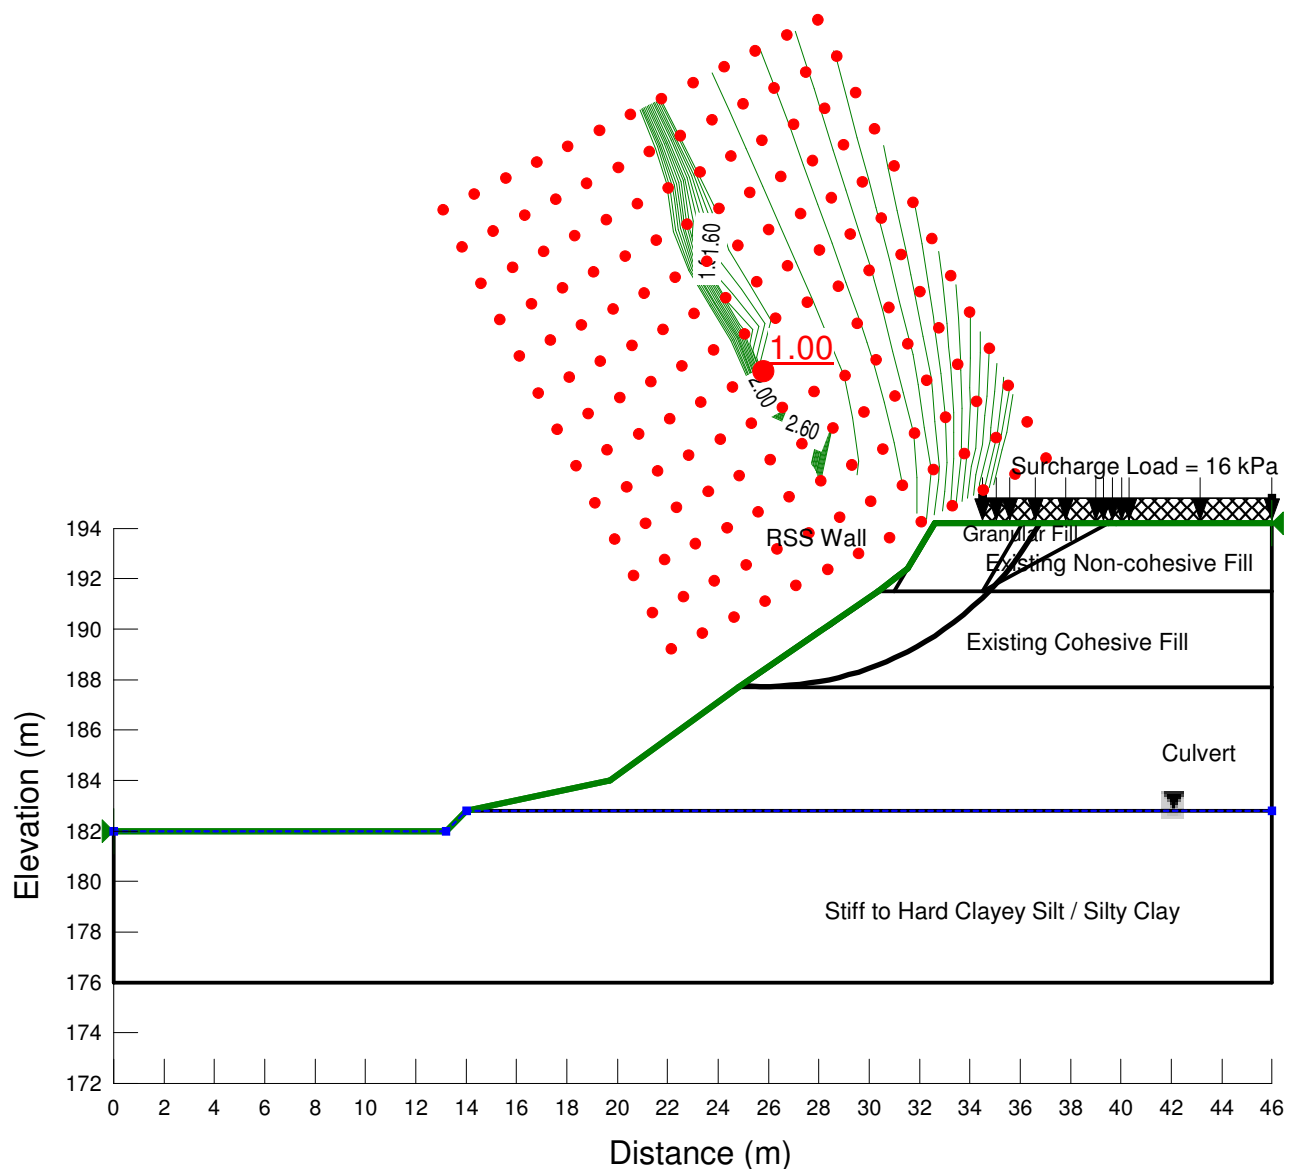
Slope Stability Analysis with Proposed RSS Wall, at culvert - Sta. 15+205
